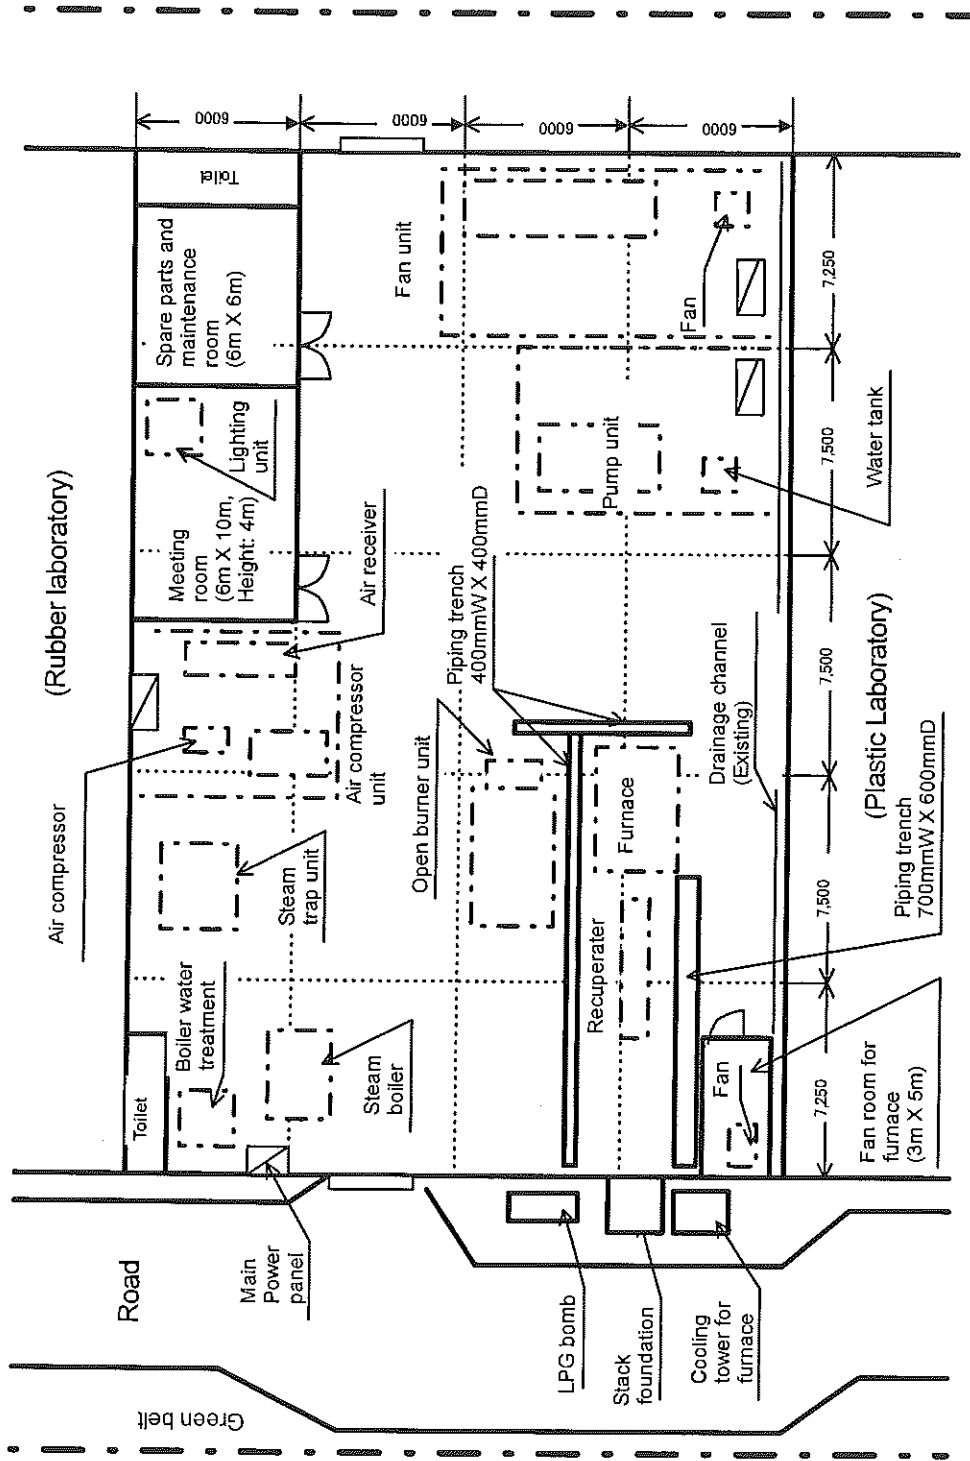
Layout of Building and Civil Work in EMTC of PRET
